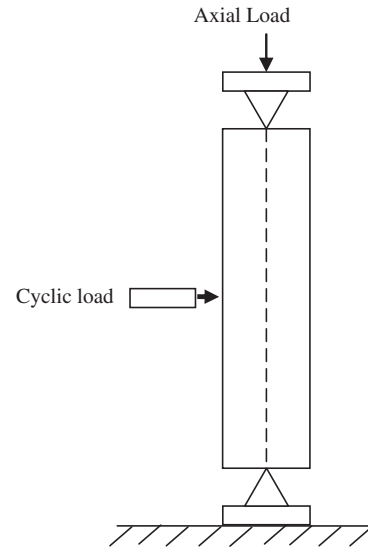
Sketch of test arrangement for cyclic loaded SRCFST column.
